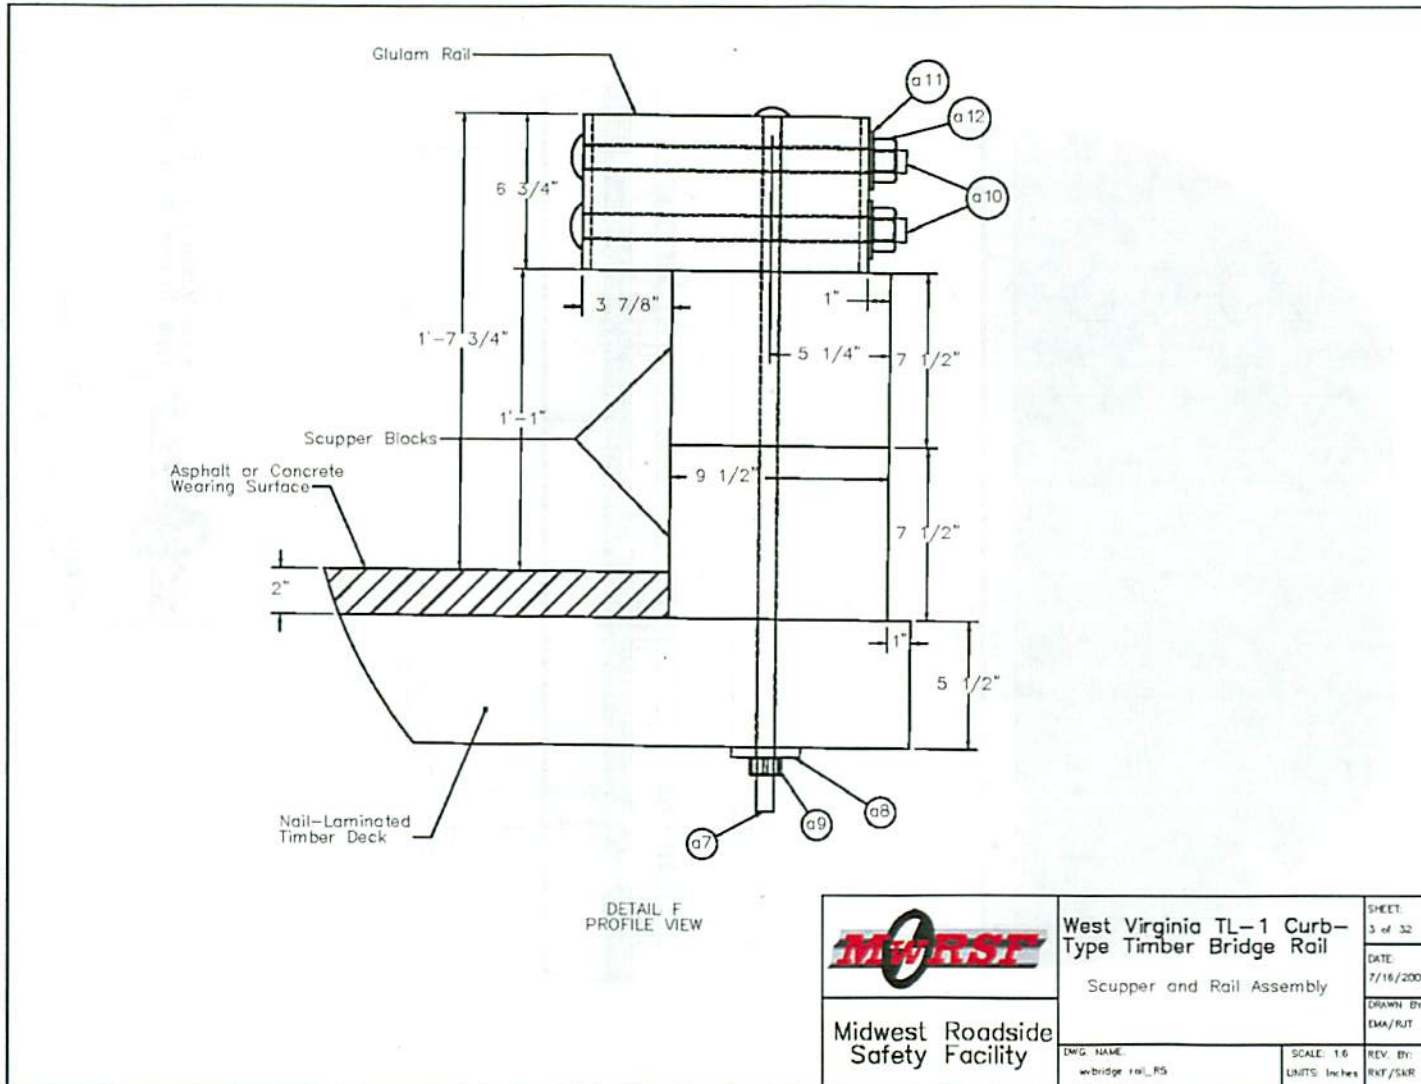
Curb-Type, Timber Bridge Rail Cross Section, Test No. WVBR-1
